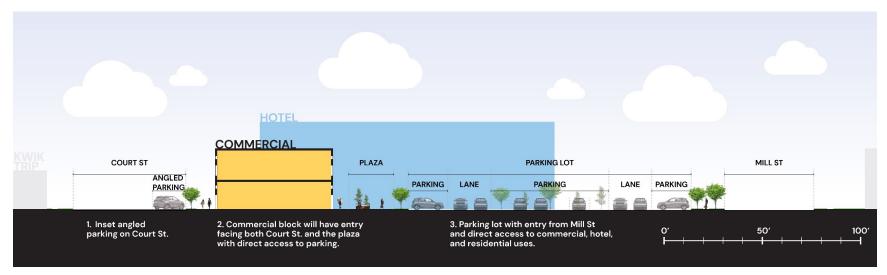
Section through W Court St, Building 2, the parking lot, and Mill Street illustrating access and basic streetscape.
